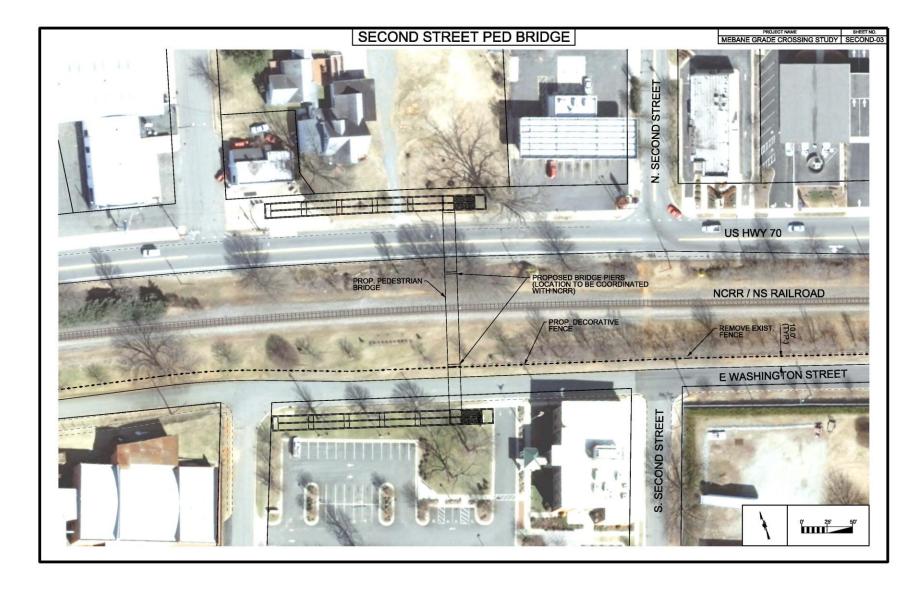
Pedestrian Crossing near Second Street – Overpass Option Recommendation
